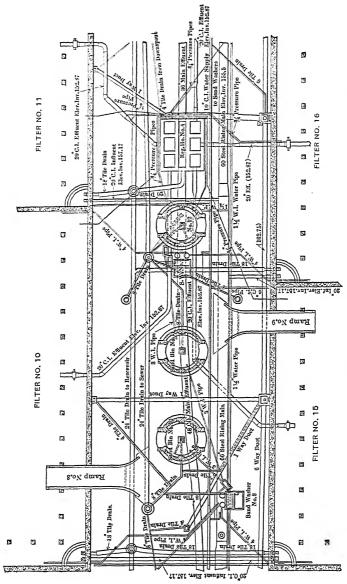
Detailed plan of piping in sand court, Washington, D. C., filtration plant.
